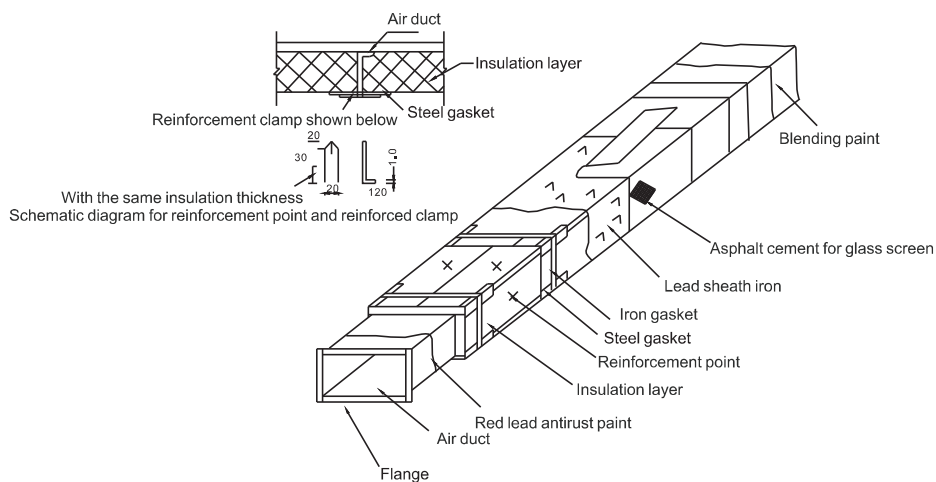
Lashing thermal insulation for rectangular air duct sheet
